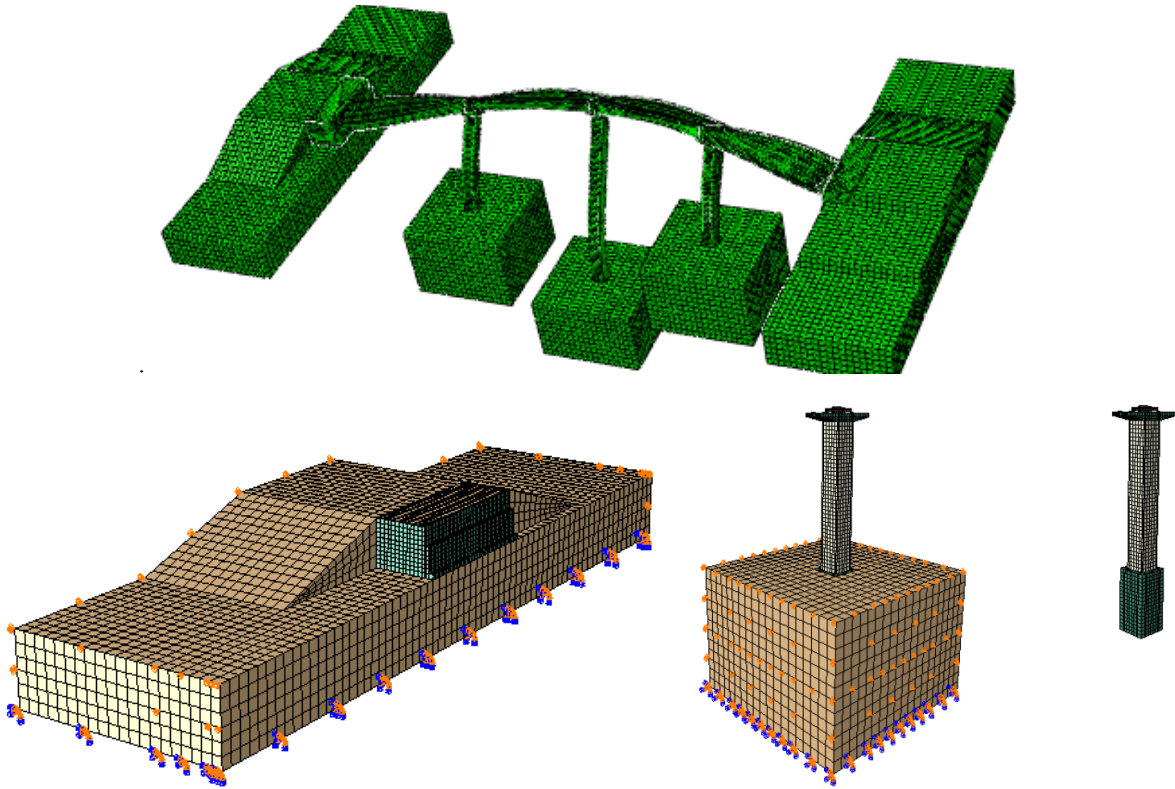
Overview and fundamental mode in the transverse direction of the flexibly supported model of the bridge ('3D – 3DSoil',  $T=1.414\text{sec}$ ) as well as modeling details of the abutment-embankment system and the pier foundation subsoil.
